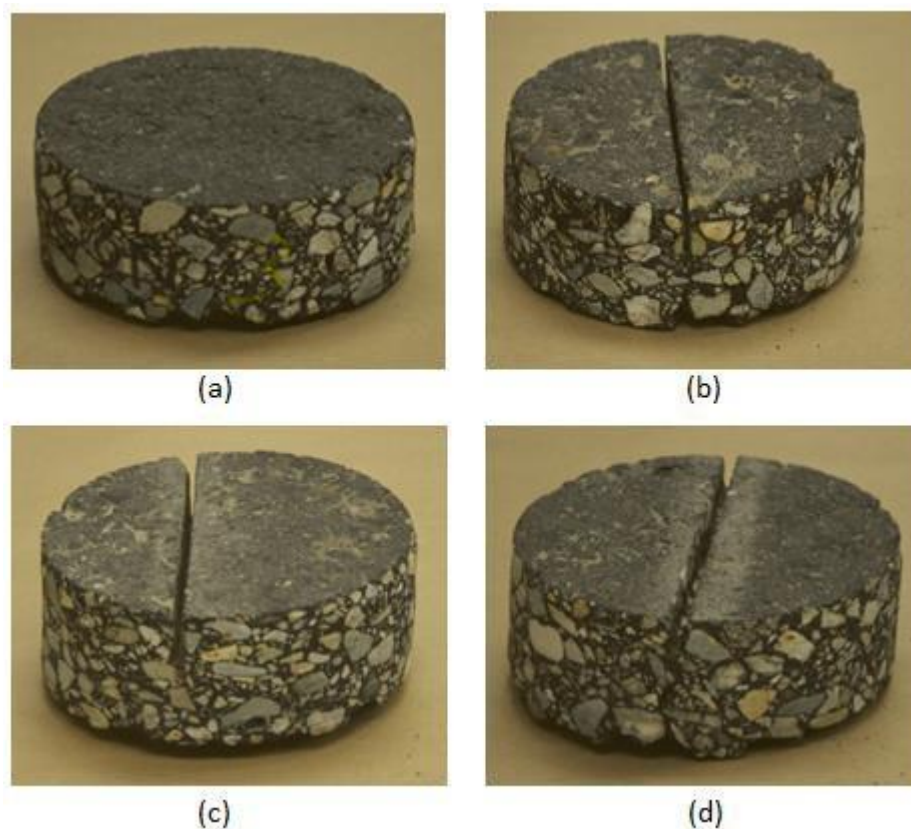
Field cores from all the four sections: (a) section 1; (b) section 2; (c) section 3; (d) section 4
